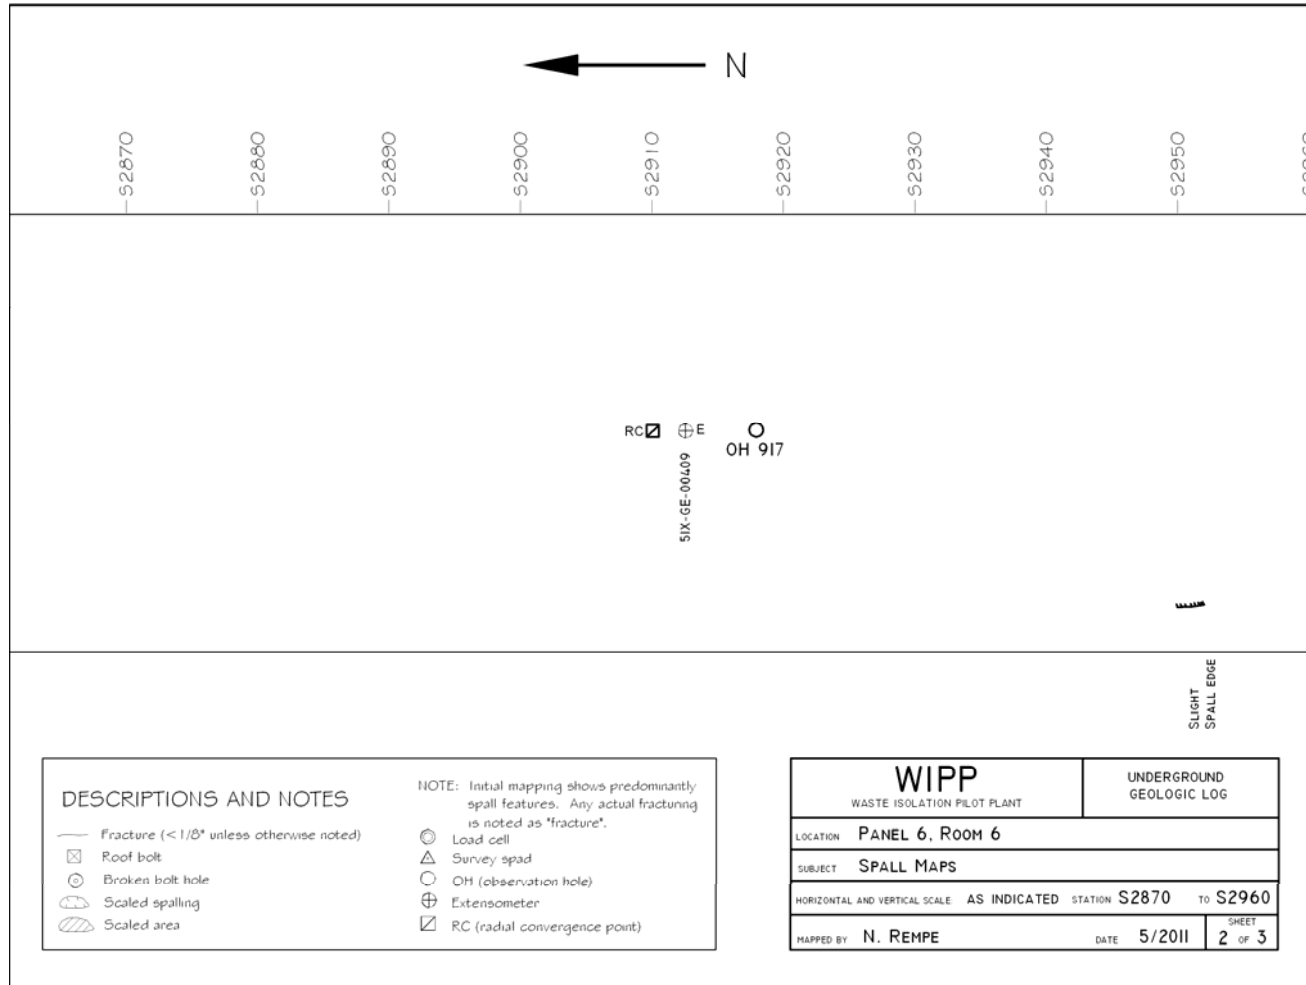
Panel 6 Room 6, S2770-S3060 Roof Fractures (Sheet 2 of 3)
